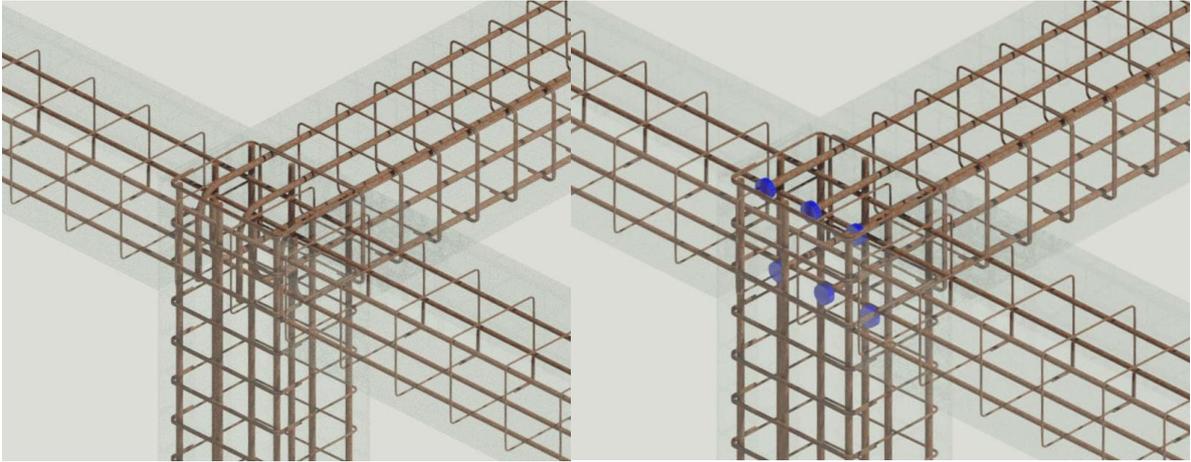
Beam to Beam Joint using traditional 90° Bent Hook
